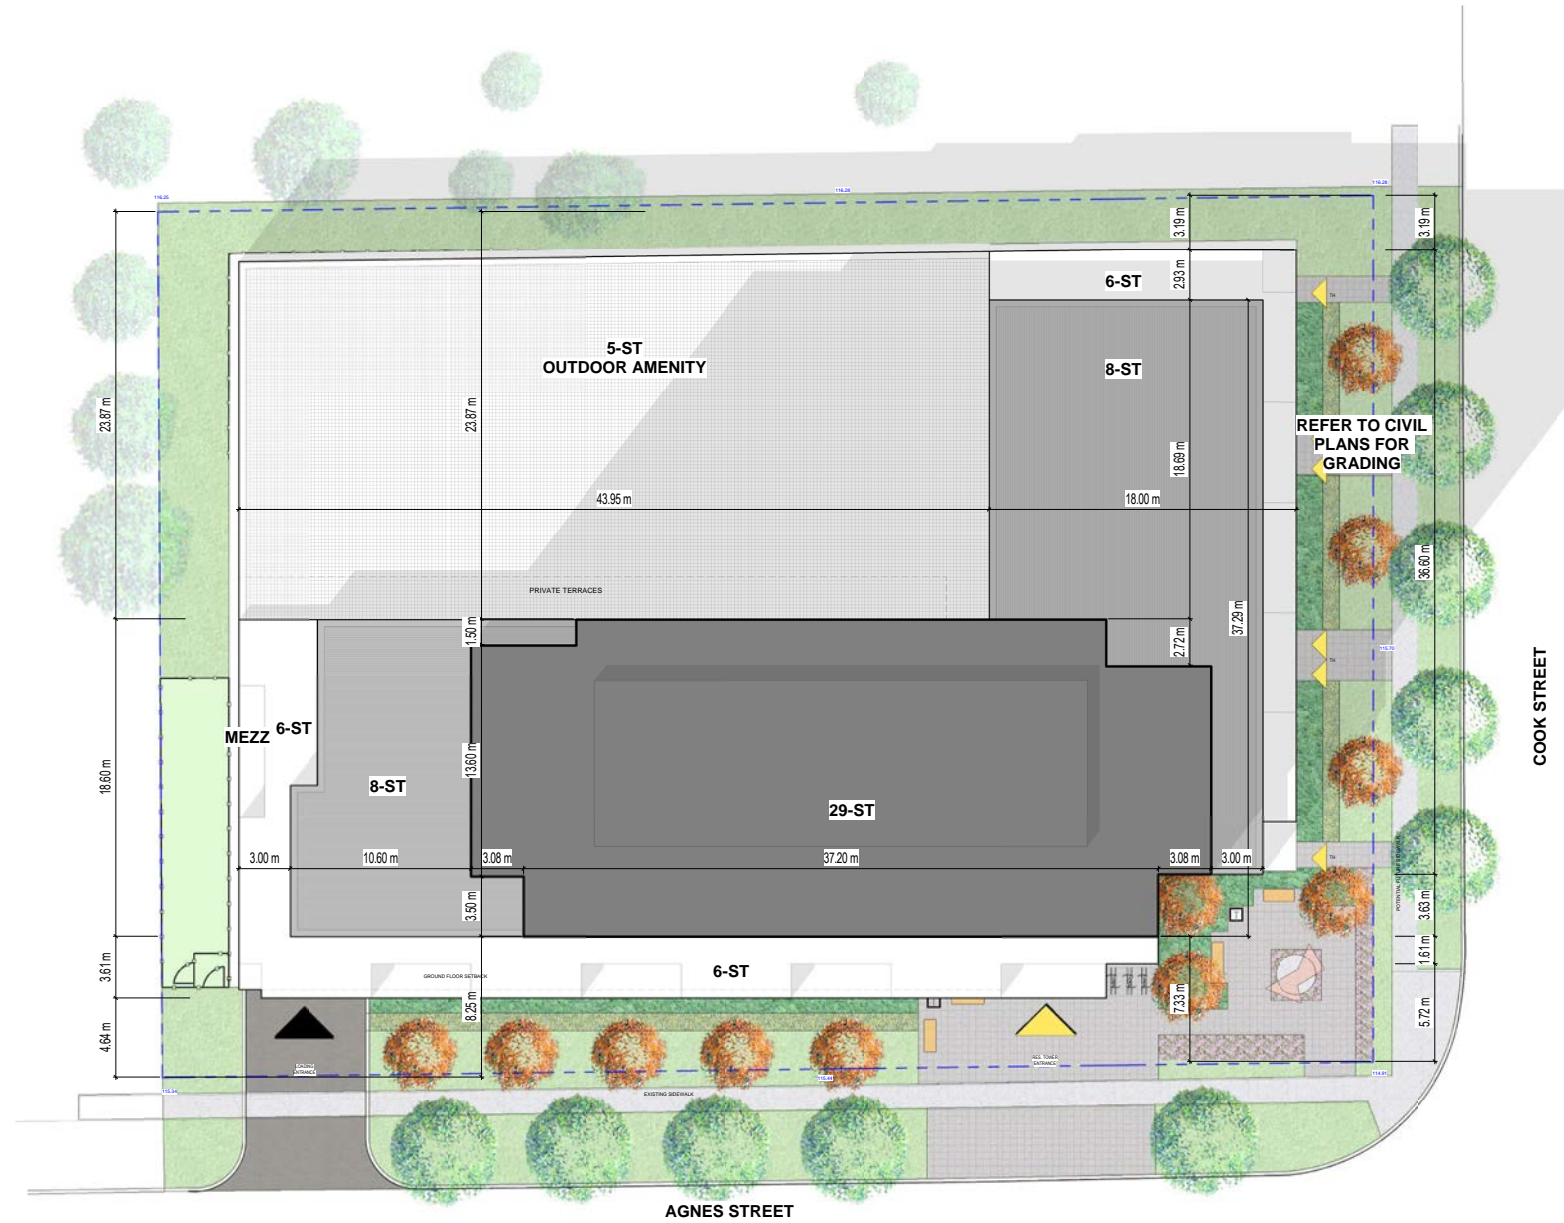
Site Plan (Prepared by Sweeny & Co Architects Inc.)
